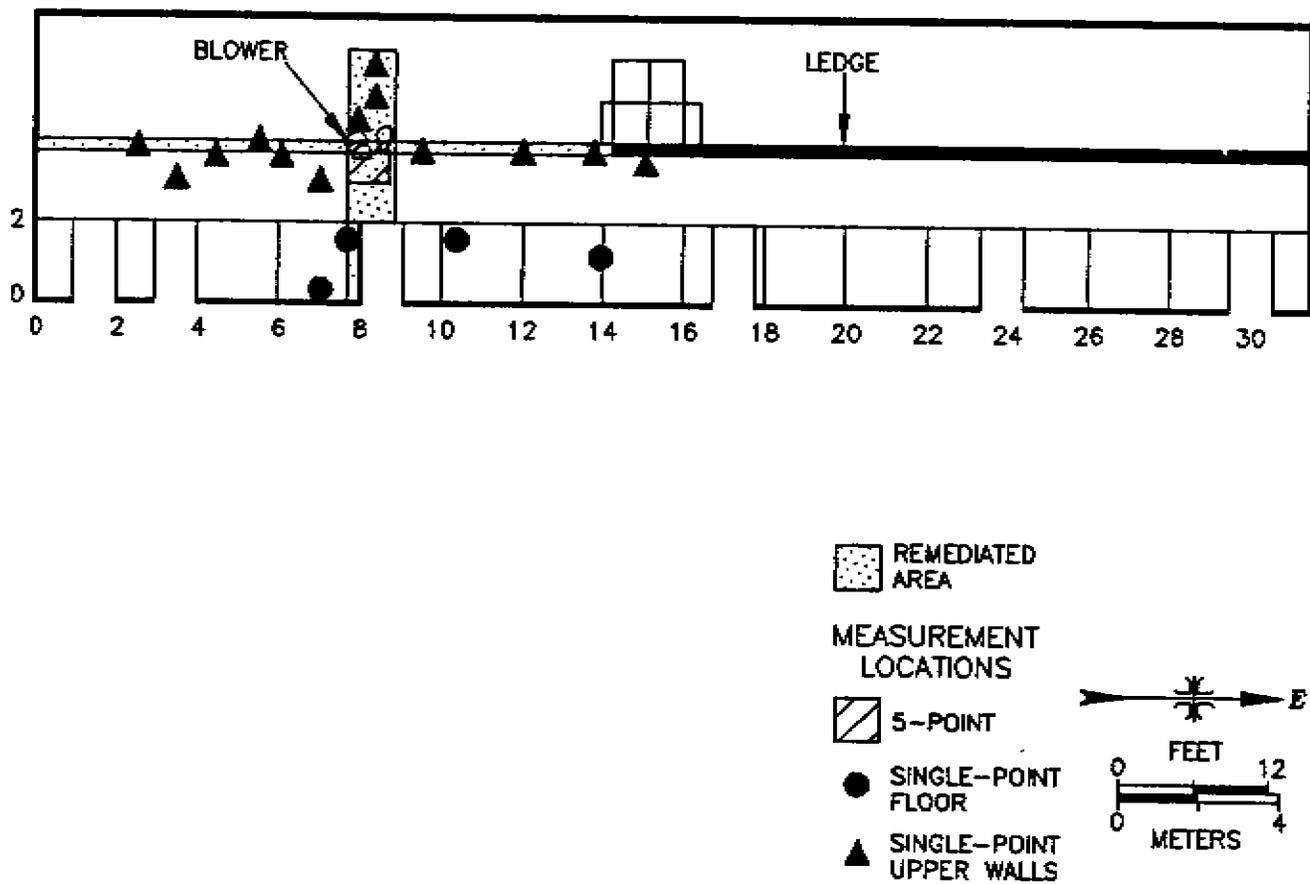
Building 23, Lab 1, North Wall, Indicating Measurement Locations
